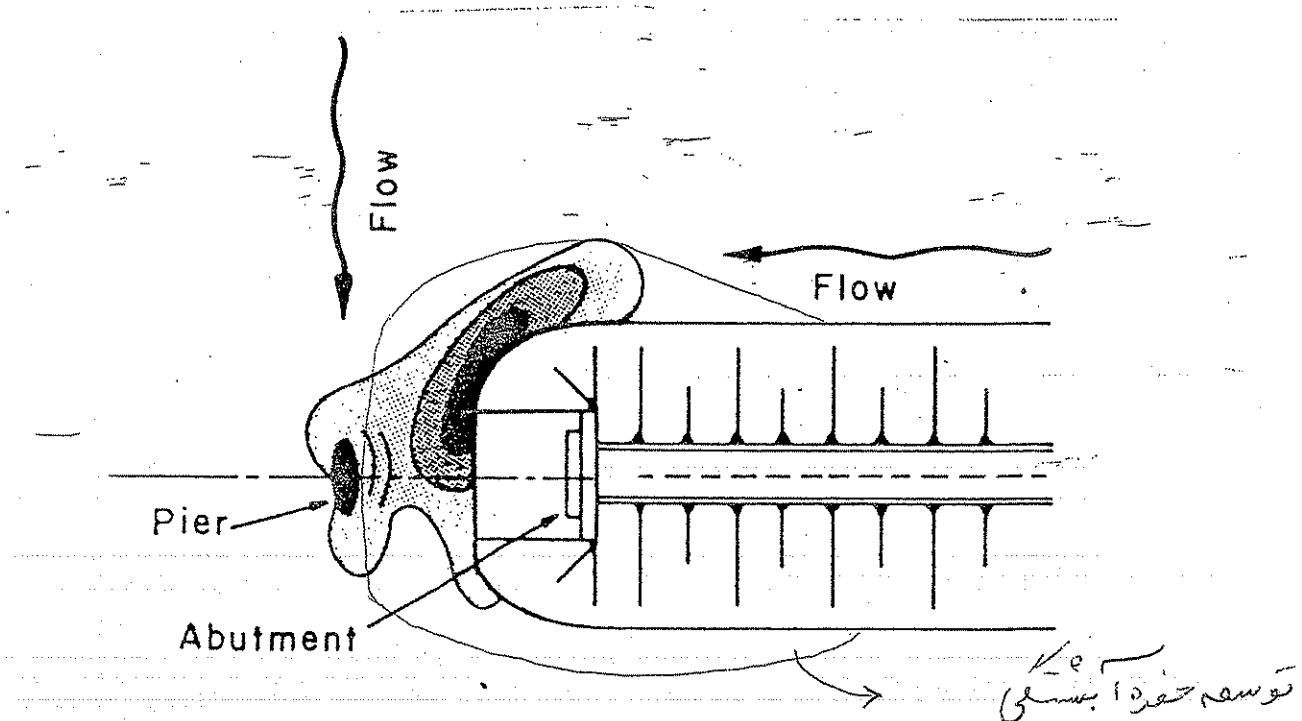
Typical scour at an embankment and adjacent pier.
